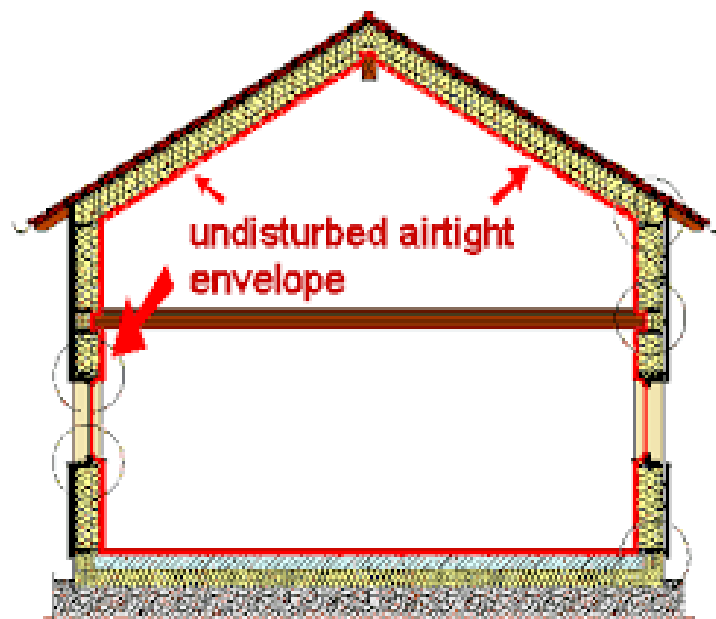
Airtight Envelope (Passivhaus Institute, 2019)
